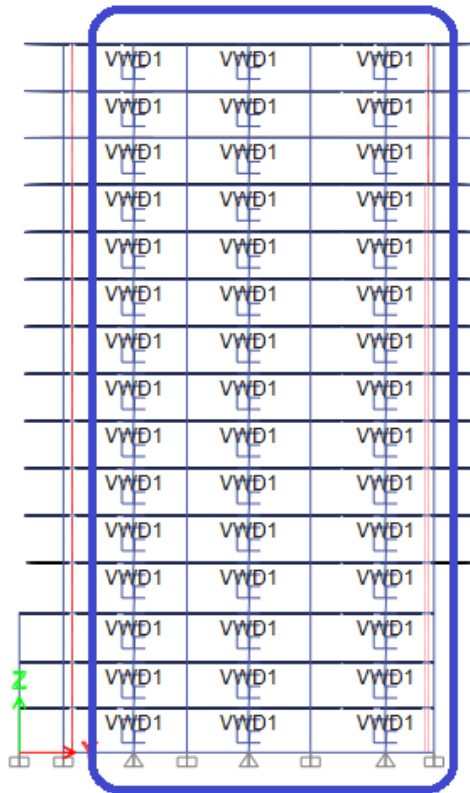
ETABS, typical elevation in Y with dampers – VWD1
